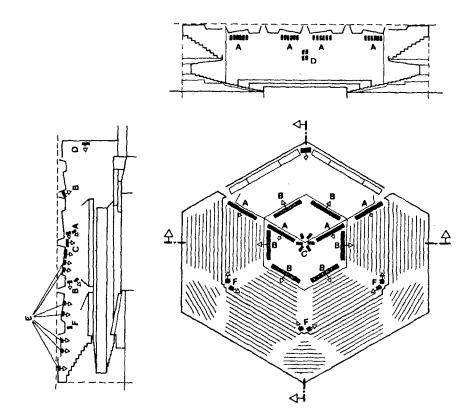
GROUND-PLAN AND CROSS-SECTIONS OF THE LARGEST VARIANT OF THE HALL ARRANGEMENT OF LOUDSPEAKER MAIN GROUPS A...F
